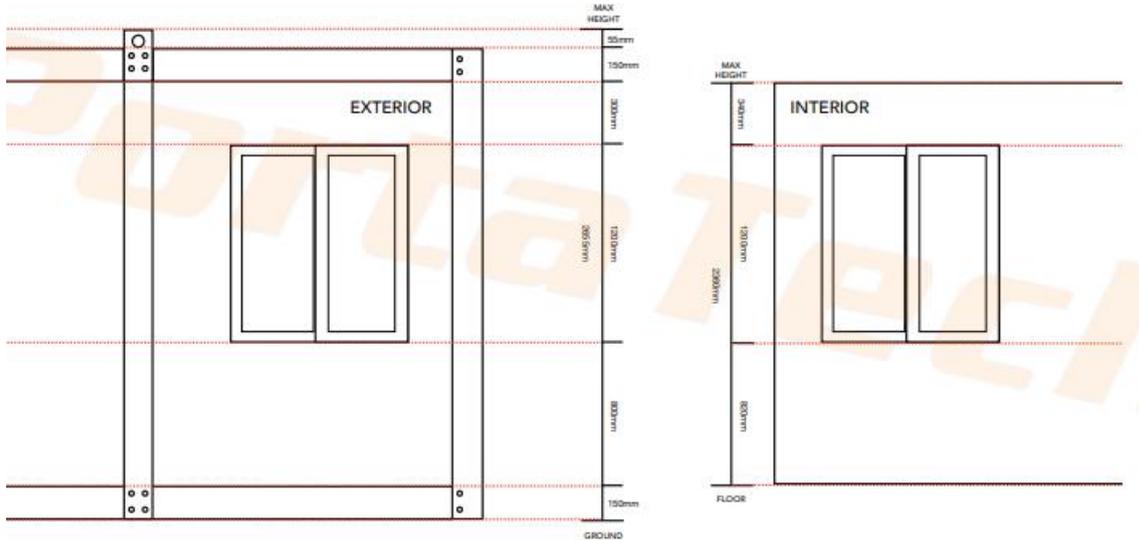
Sound-proofed windows installed in accommodation units.
